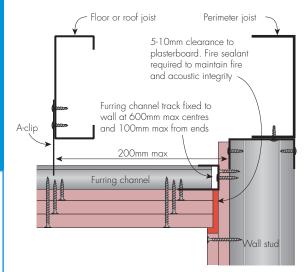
Fire Rated Ceiling to Wall – Alternate Detail A-clip and furring channel
